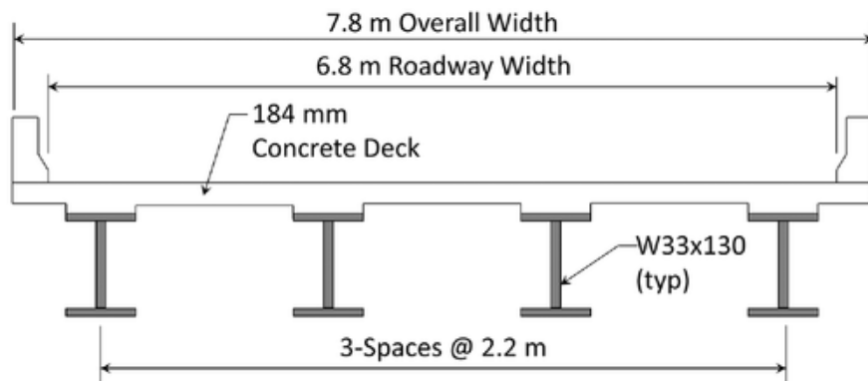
AASHTO MBE example bridge A1 cross-section (Tohme and Yarnold, 2020)
